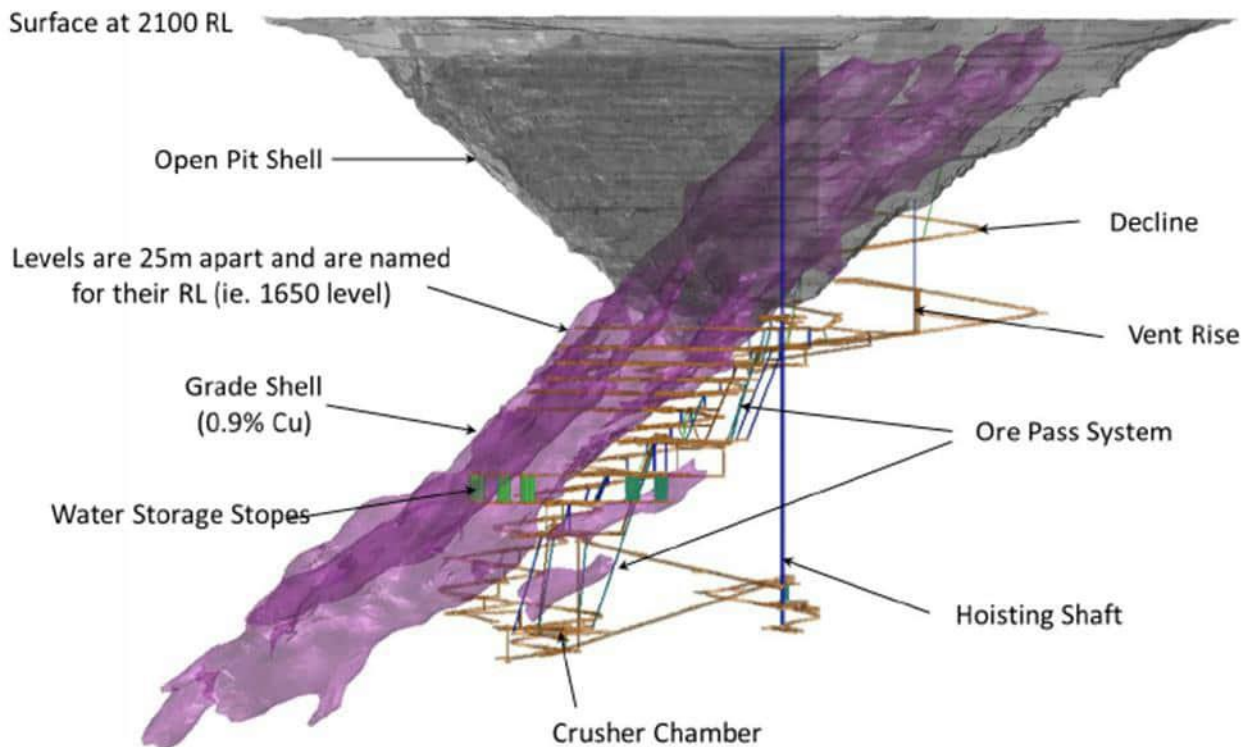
EHO ore body (grade shell), pit shell, and underground decline (looking west)
